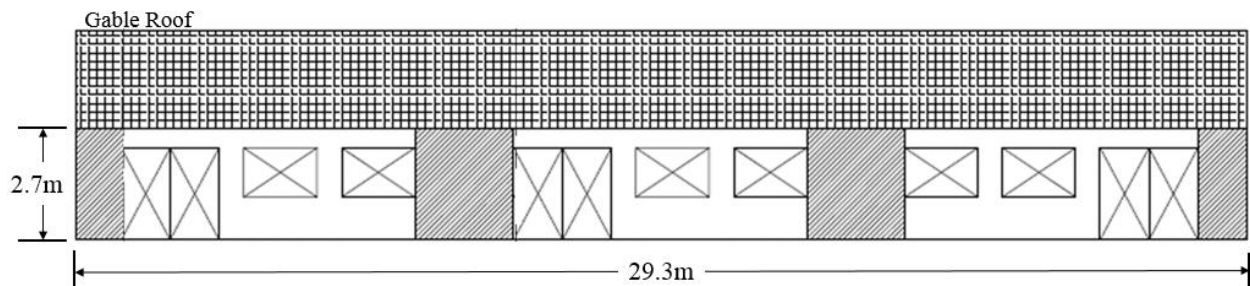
Elevation view of the one-story multifamily building used in this study, and designed for the purposes of ATC 116 (Image provided by D. Jared DeBock and modified here).
